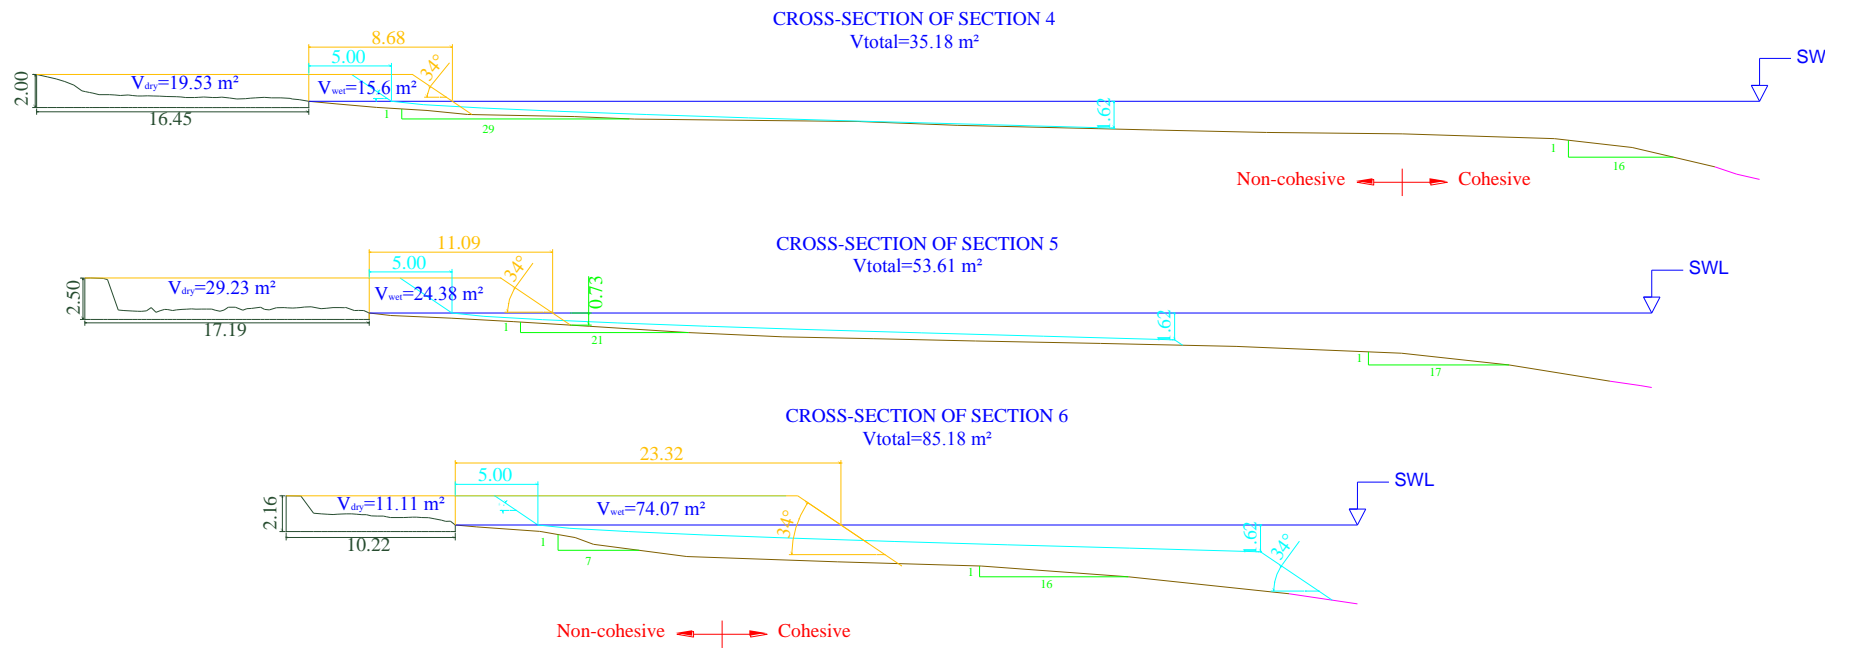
Design profiles of Section 4,5 and 6 for 5 m new dry beach width ($D_{\text{fill}}=0.32 \text{ mm}$).
